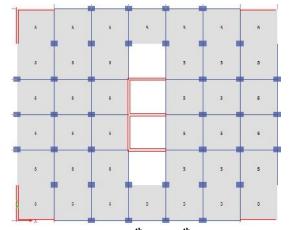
Plan of Building at  $18^{th}$  and  $19^{th}$  Floor level (SDL = 5 kN/sqm)
